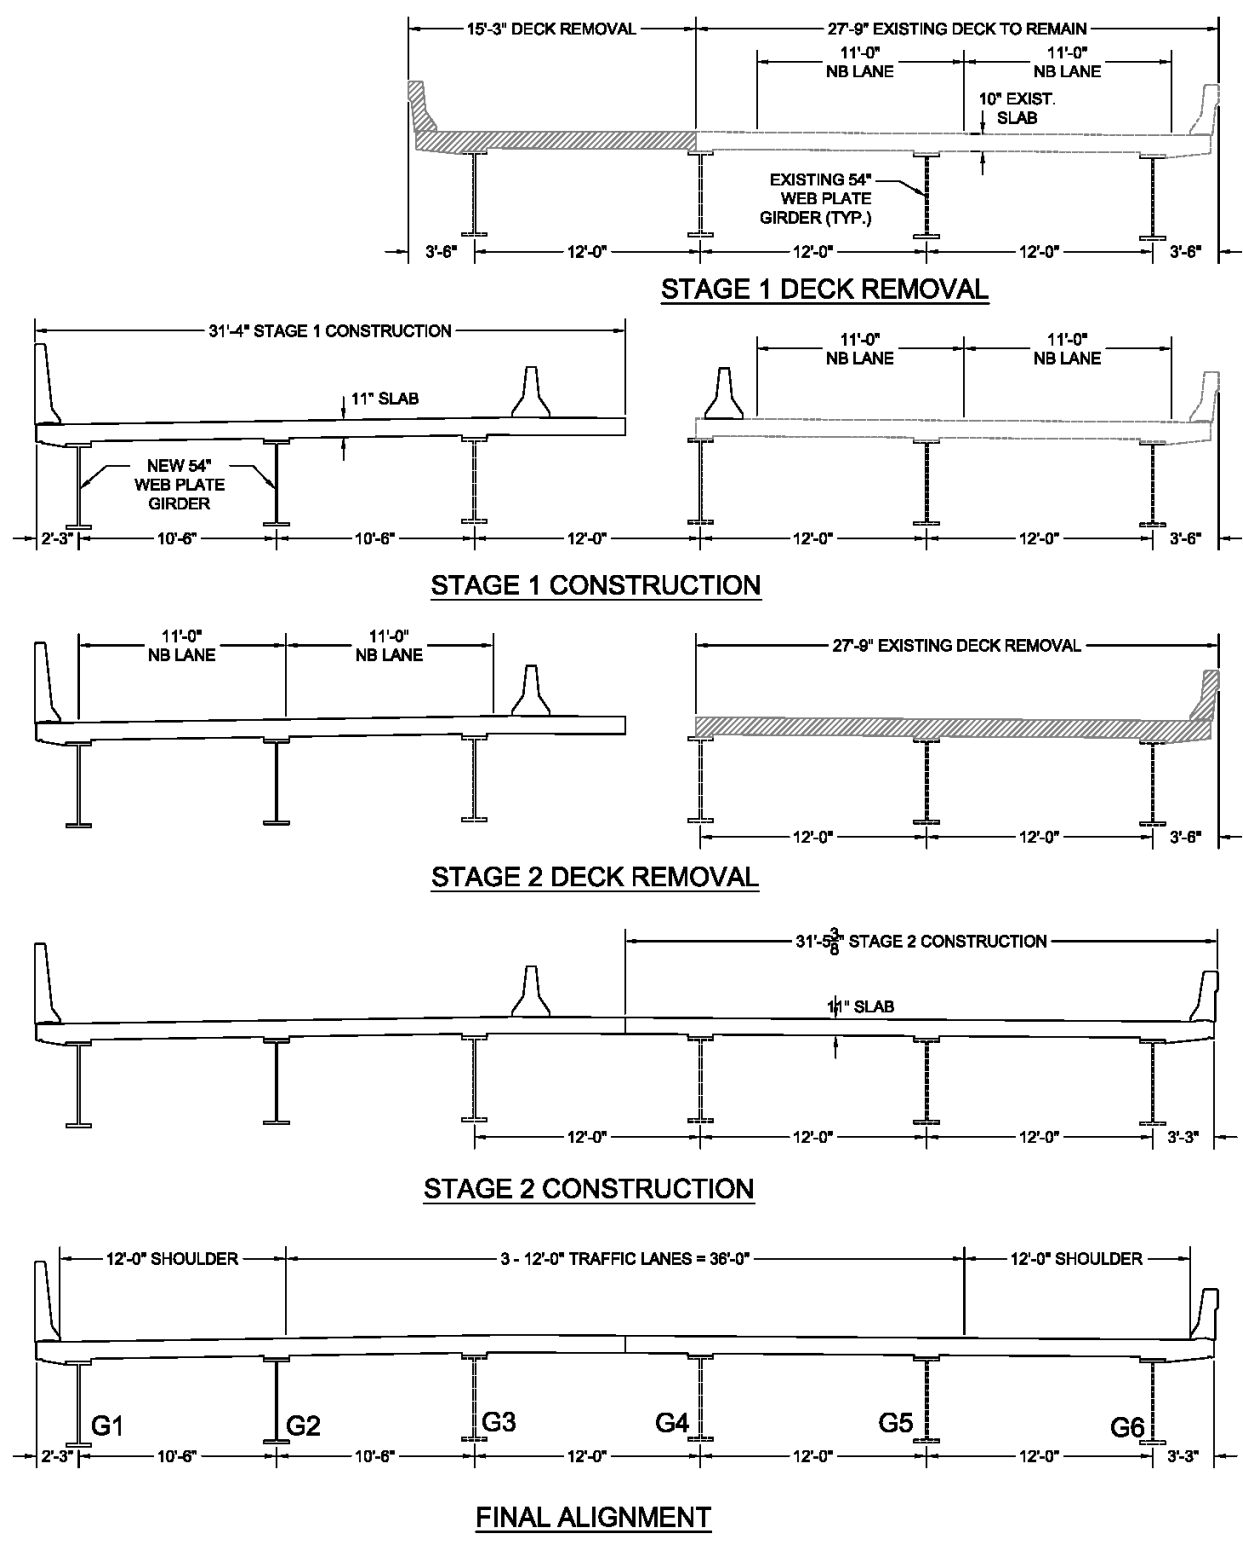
Bridge B-70-177 Deck Replacement and Widening Sequence (looking north)
